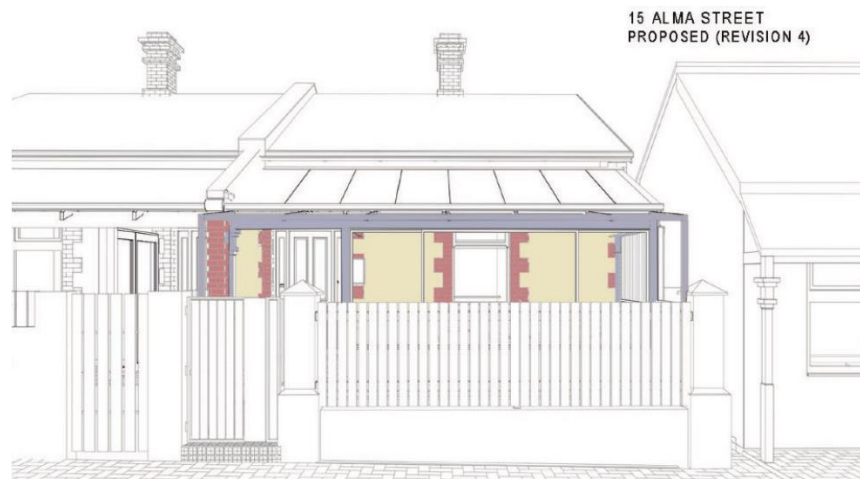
Streetscape impression of proposed work (submitted by the applicant)
